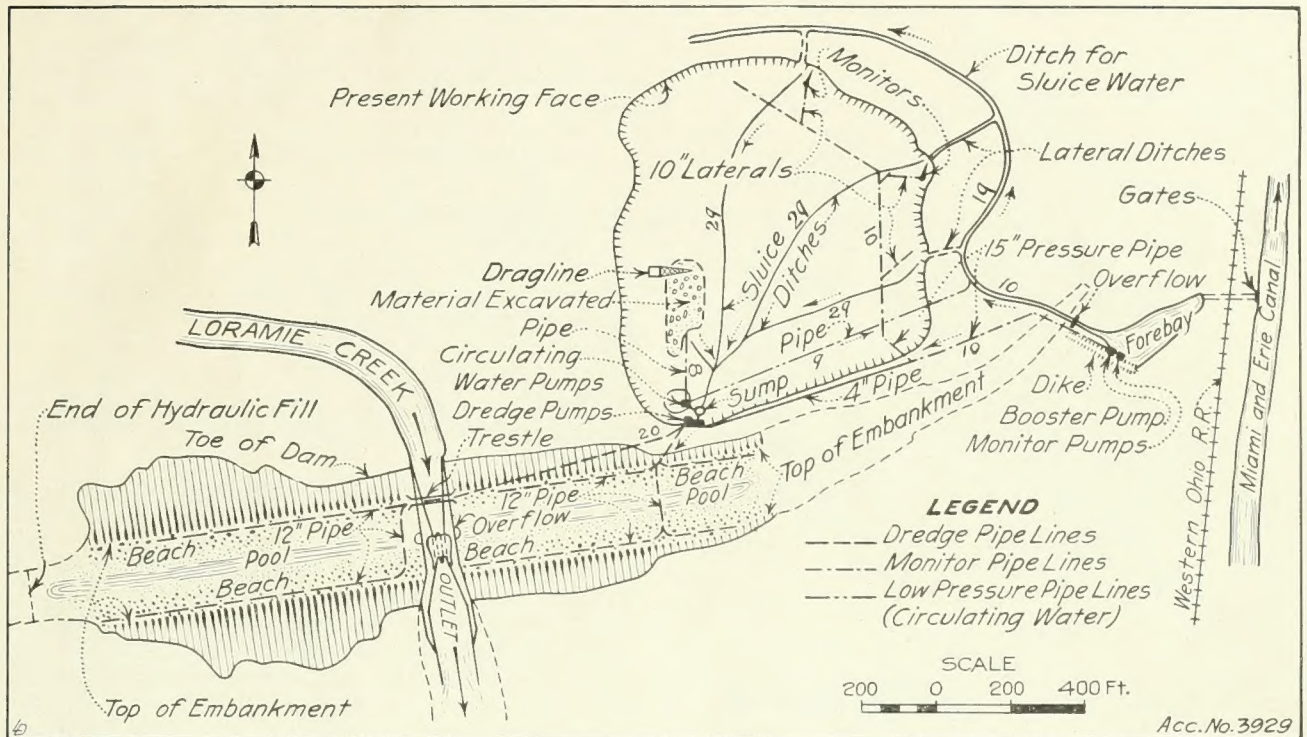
BORROW PIT AND PUMPING LAYOUT AT LOCKINGTON DAM IN AUGUST, 1920.
